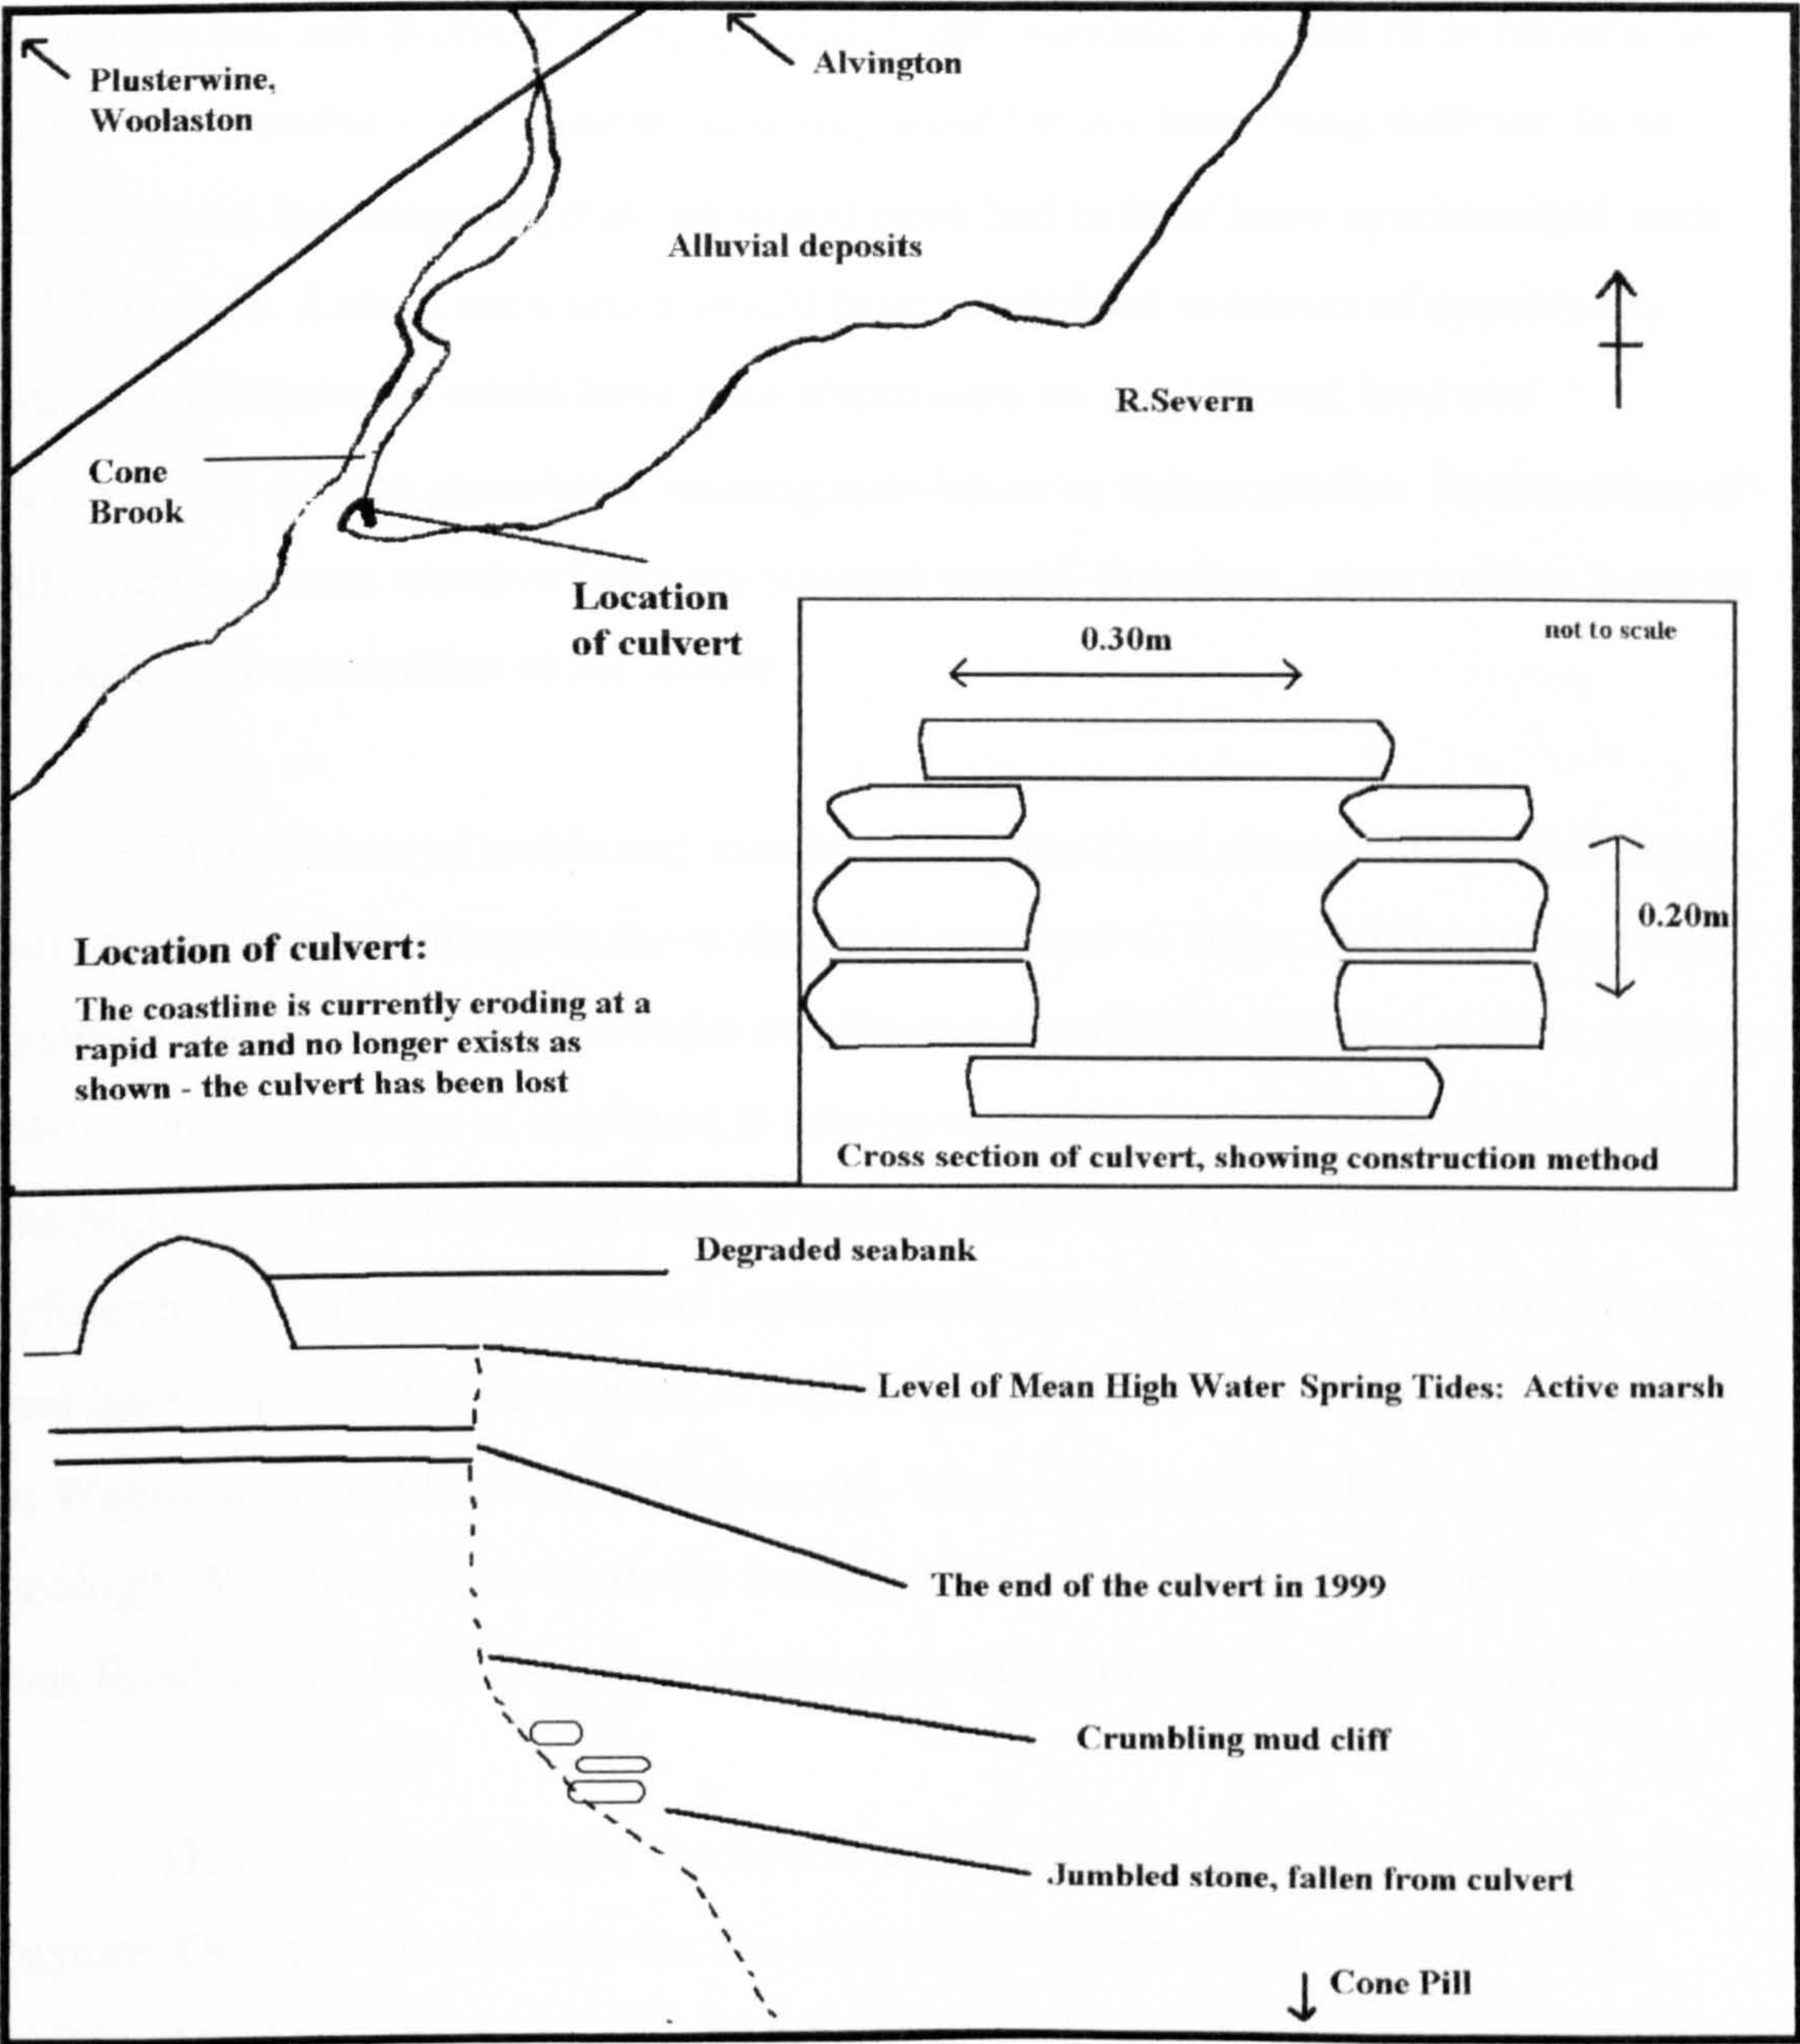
Diagram of a truncated culvert under a sea bank near Cone Pill.
